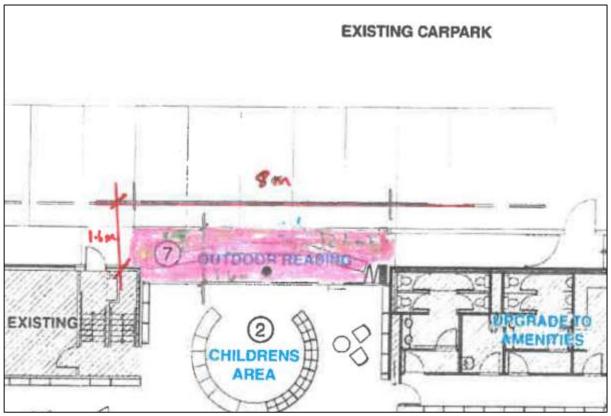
Extract of the provided floor plan with the proposed outdoor reading area shown in colour.
